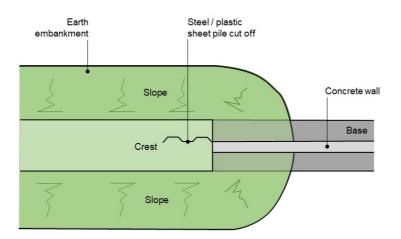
Installation of sheet pile to lengthen seepage path – type 1
